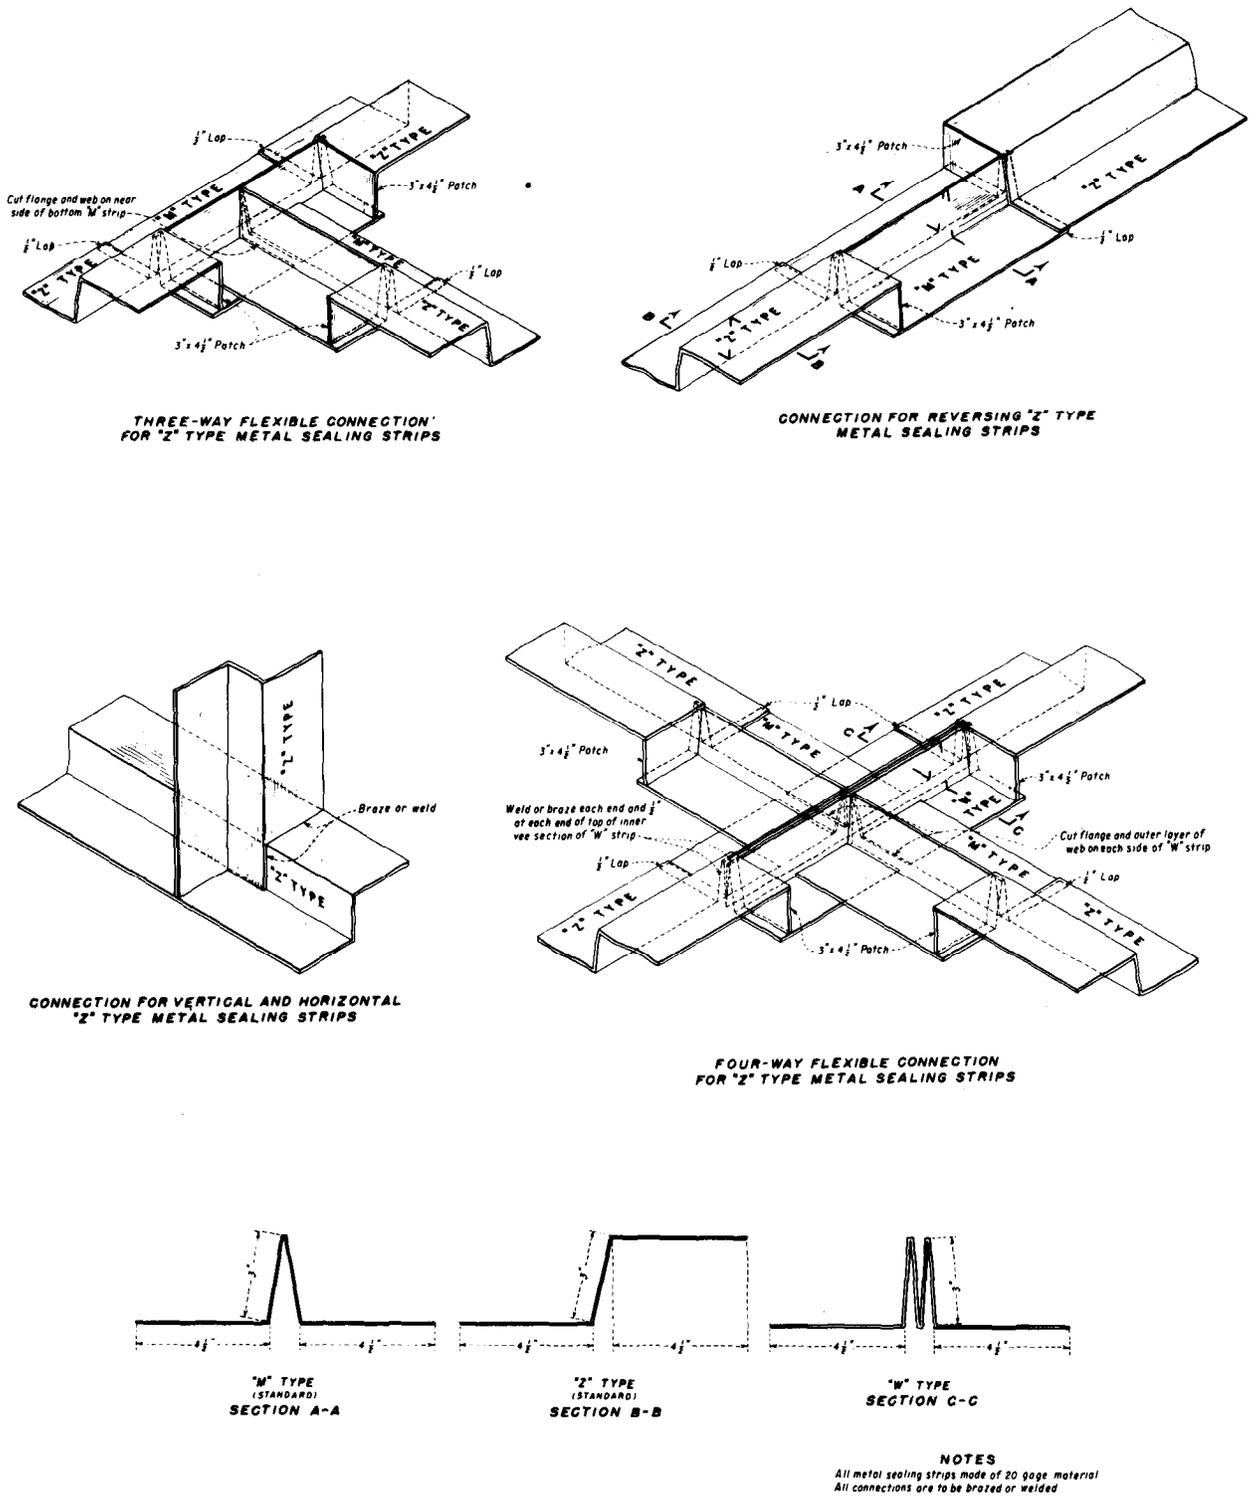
Metal seals and connections at contraction joints.—288-D-3200
